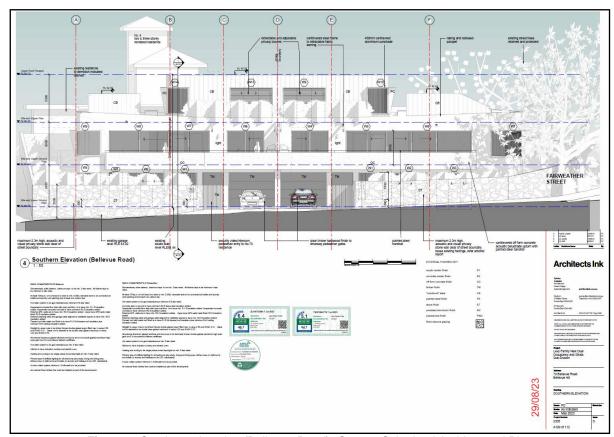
Southern elevation (Bellevue Road). Source: Submitted Architectural Plan
